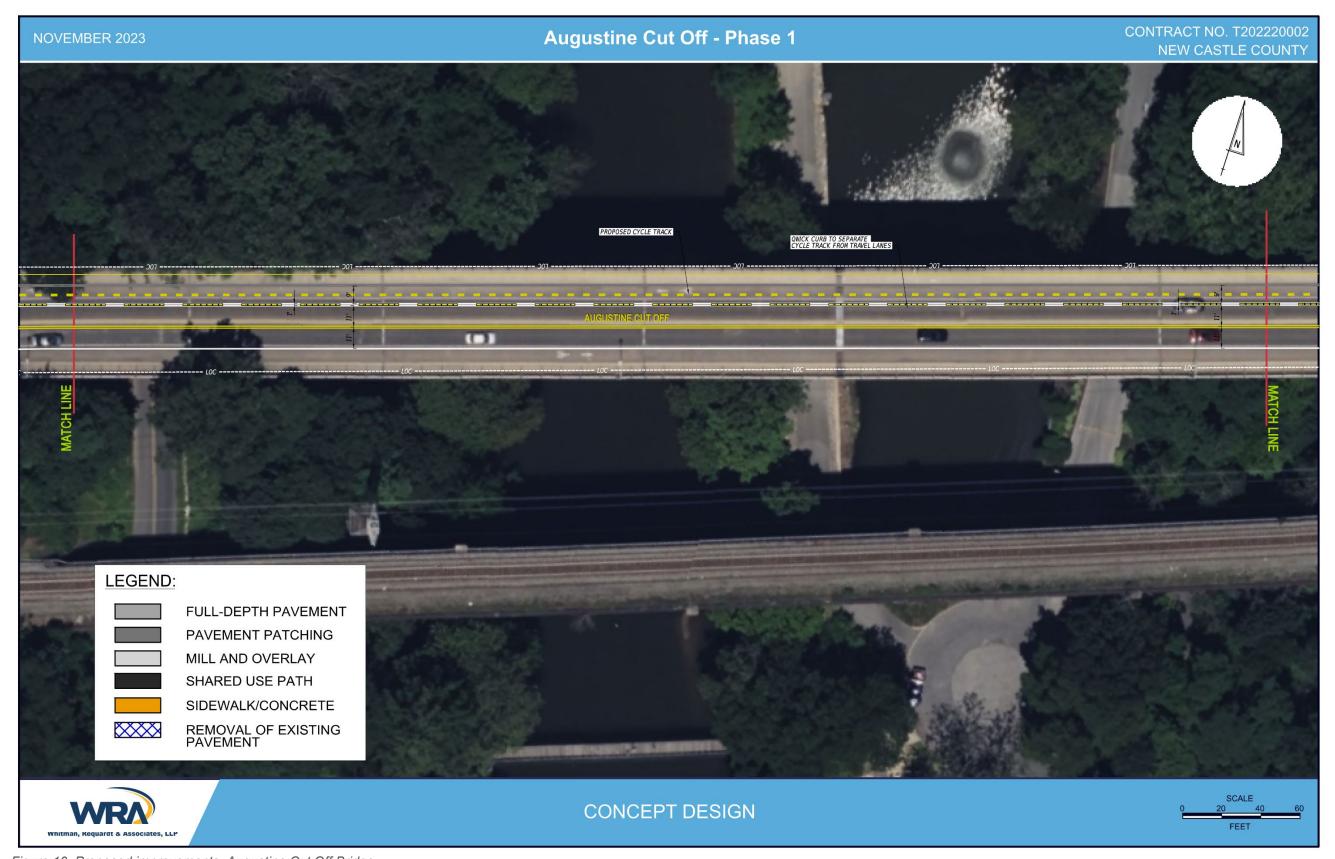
Proposed improvements, Augustine Cut Off Bridge
